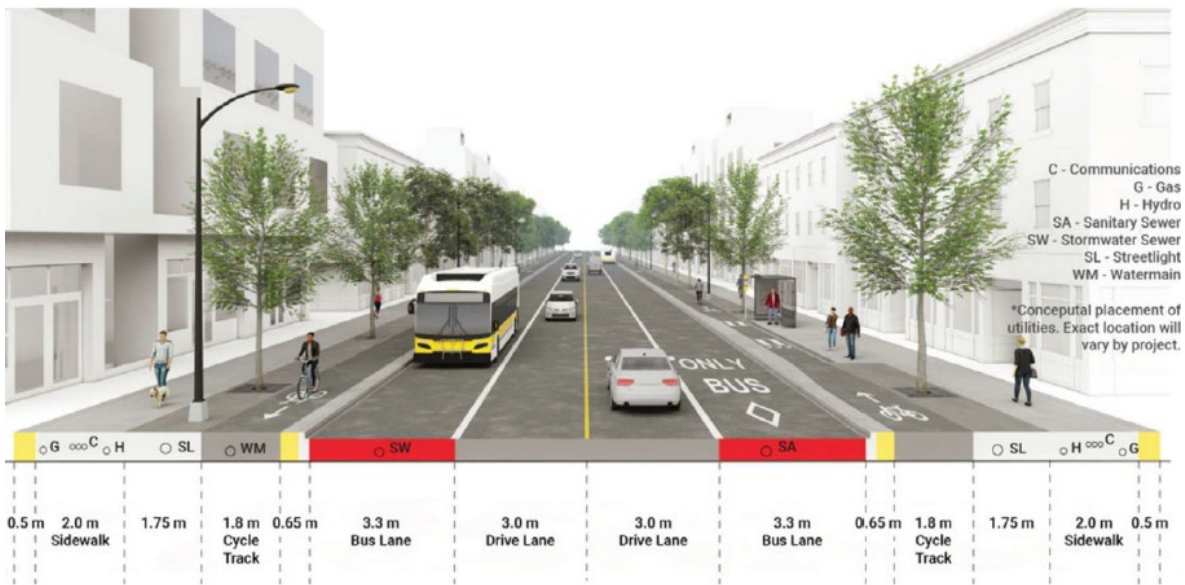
26 m ROW Urban Avenue Typical Cross-Section Design. Source: nexTrans Consulting Engineers
